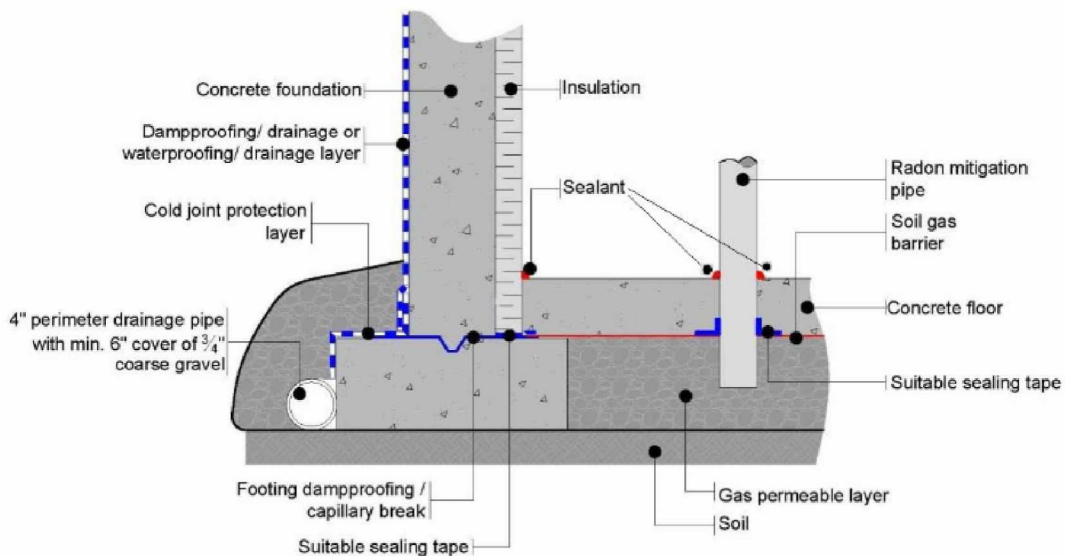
Sealing sub-slab membrane horizontally to concrete footing when insulation is between the foundation wall and floor slab
